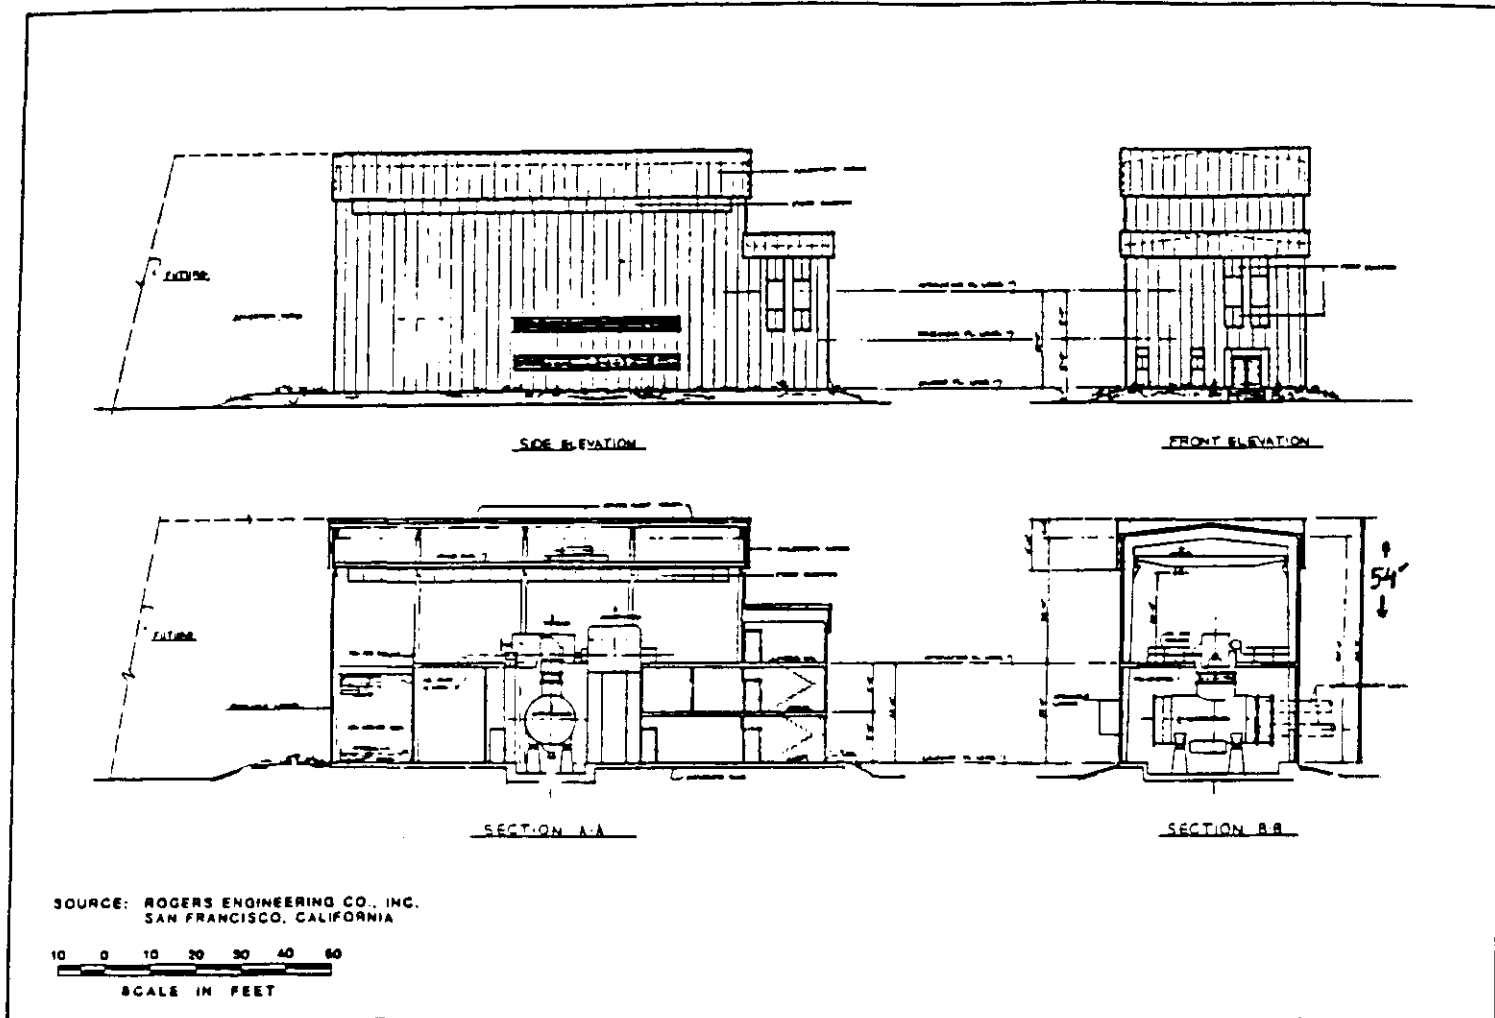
Elevations and Sections - Initial 12.5 MWe Power Plant.
